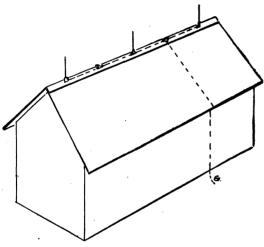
Method of placing lightning rods on a building having no cupola or chimney. Length of building, about 25 feet.
